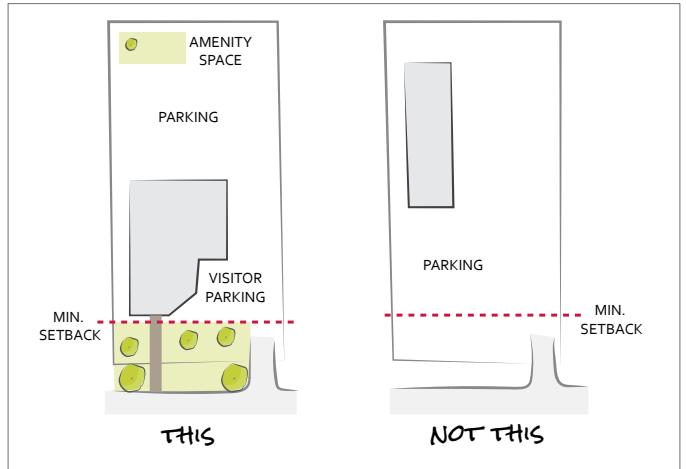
The preferred location for main parking areas is at the side and/or rear of the building (6.4.3 a). Provide landscaped amenity space and landscaping to soften the street edge.
